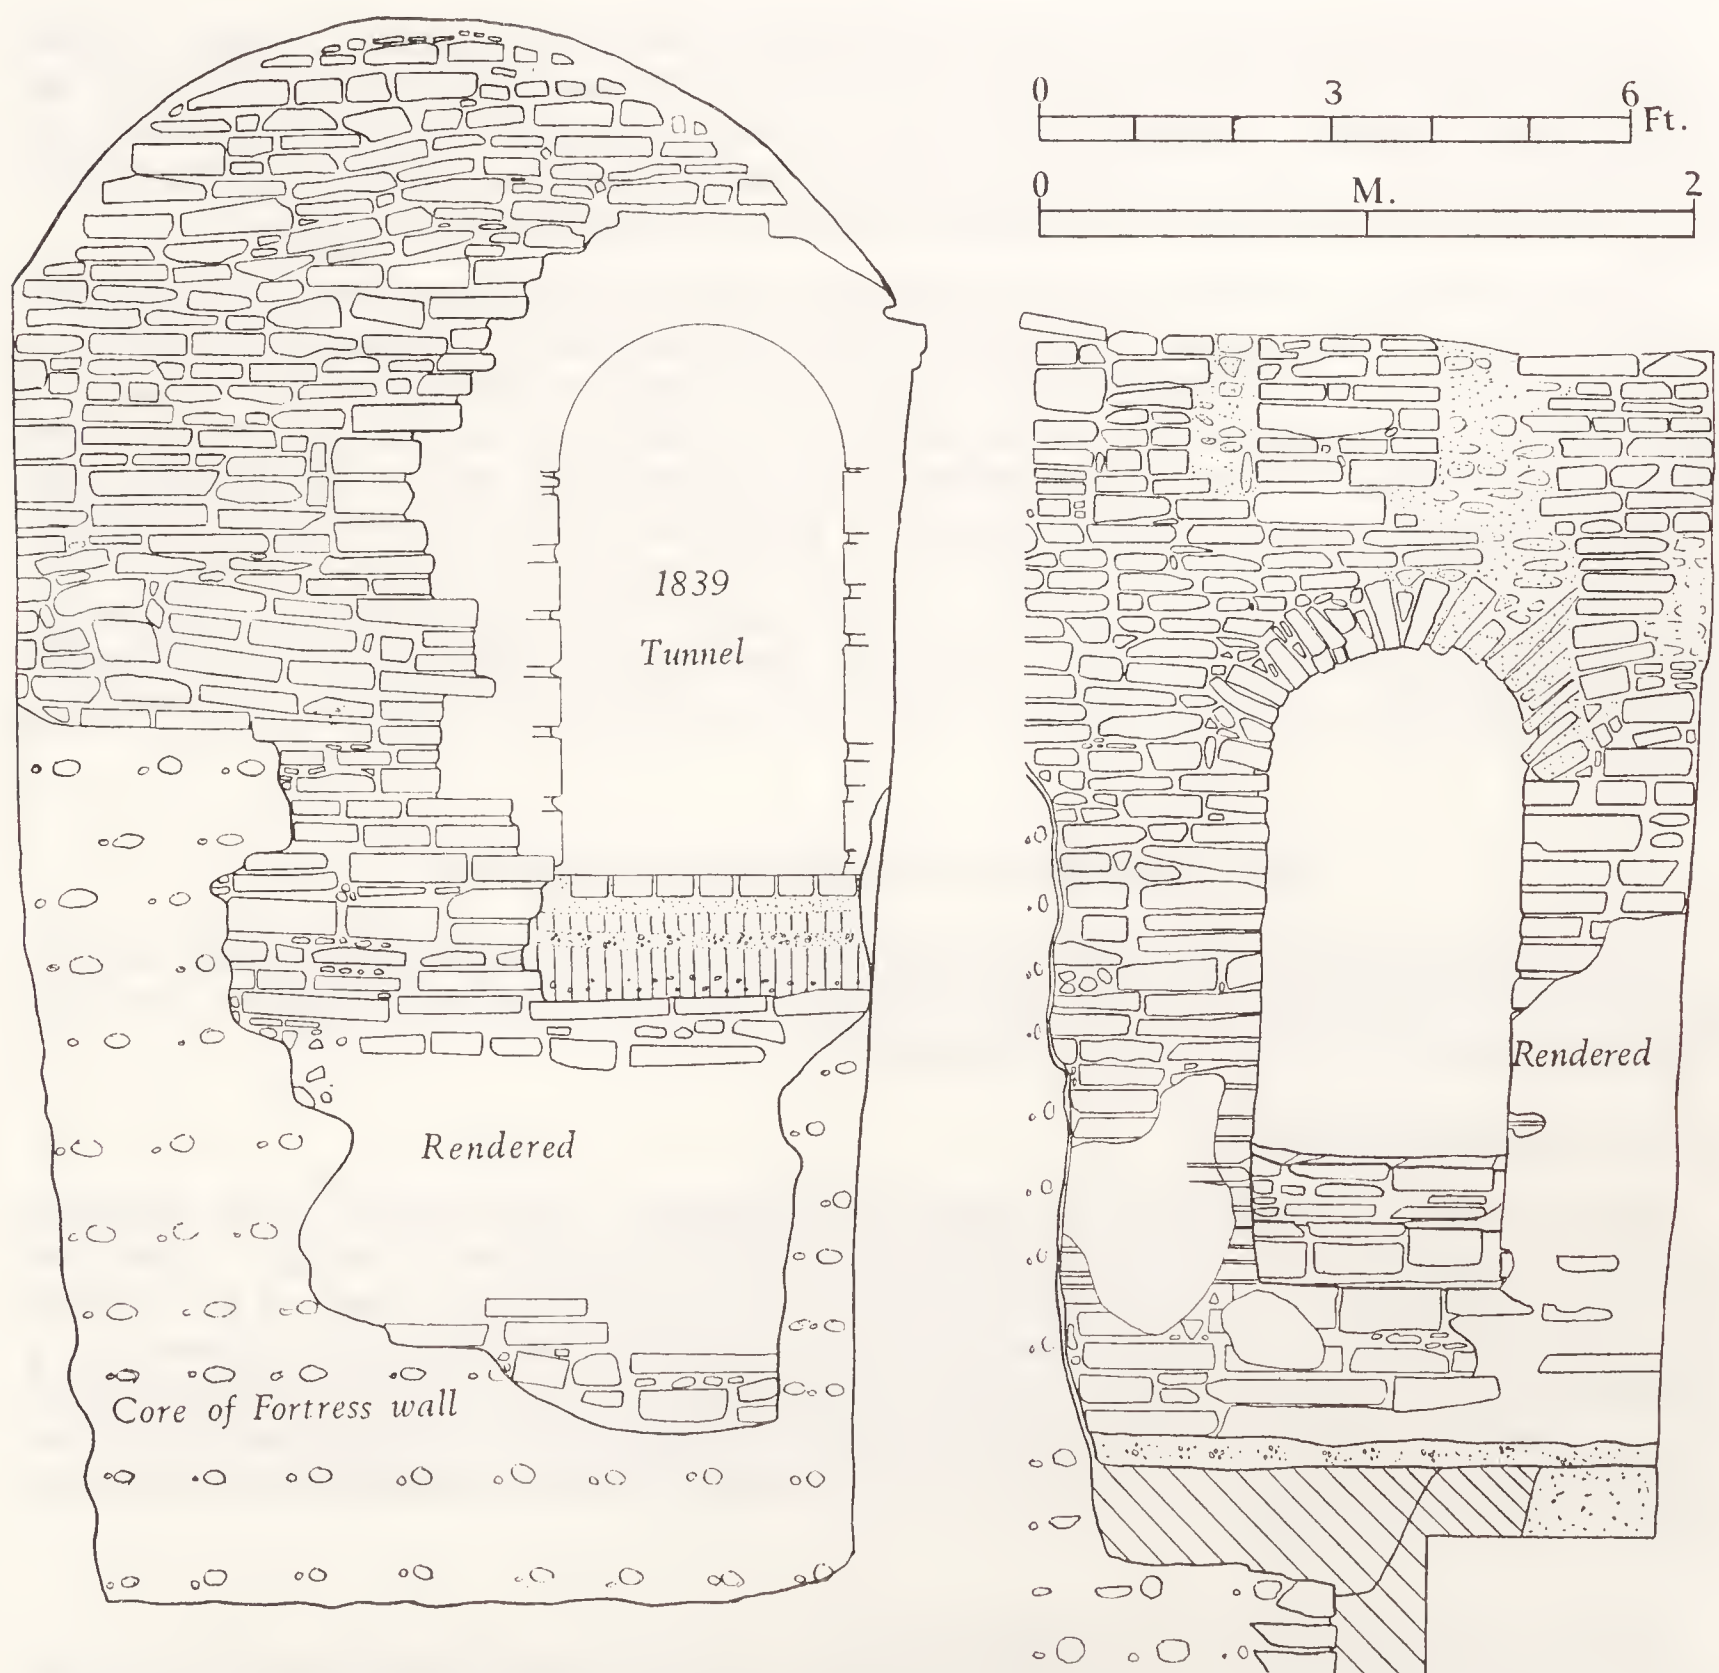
Elevations of internal walls of tower: northwest (left); northeast (right). The stippled area indicates where facing stones are missing.
